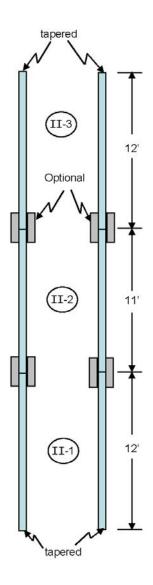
Pre-Construction Diagram of the Layout of Joists for Bridge No. 2
